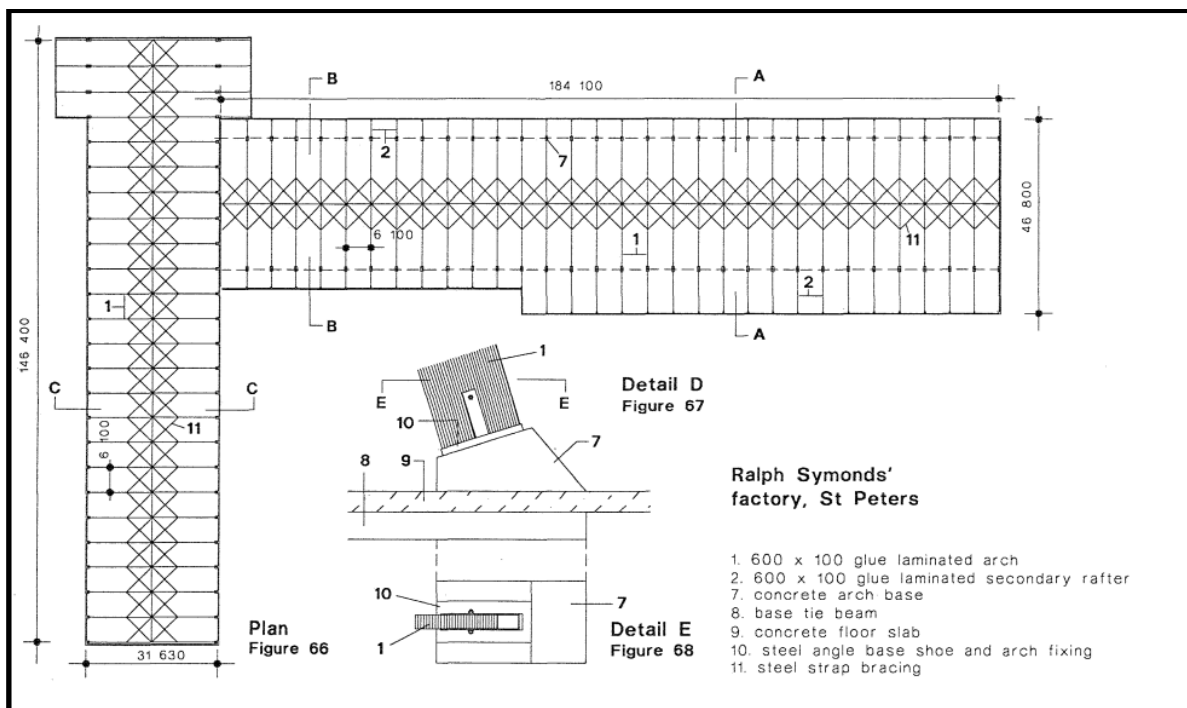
Plan of building 1994. Shows full extent of Holland Street arm (horizontal), which has since been shortened. (Source: Nolan, 1994).
